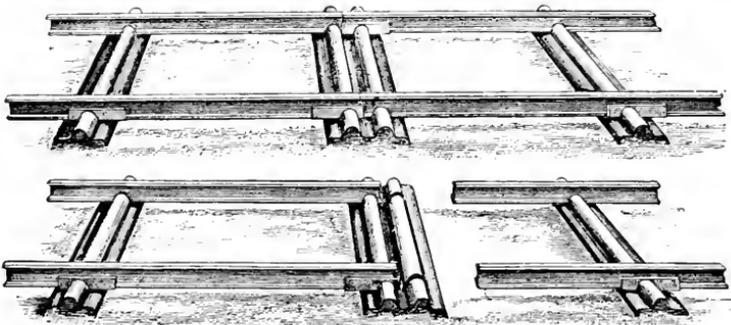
PORTABLE RAILWAY, SHOWING JOINTING SLEEPERS.
